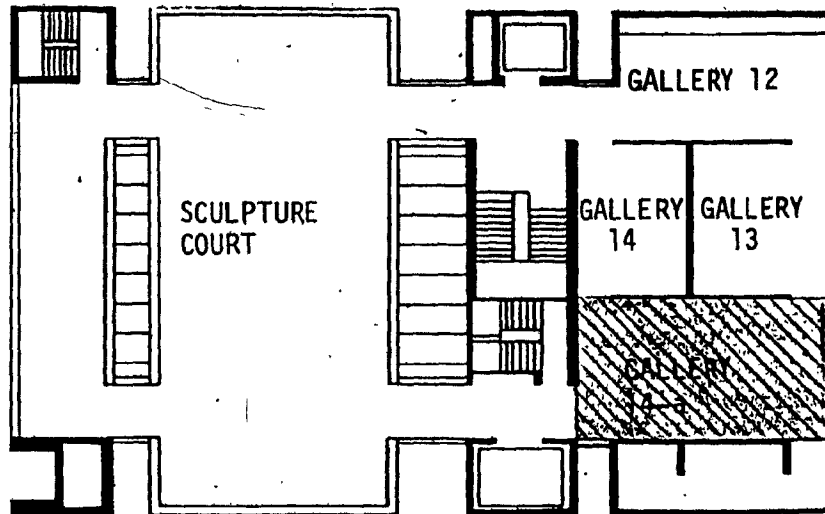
, Second floor plan, Gallery studied is shaded.
